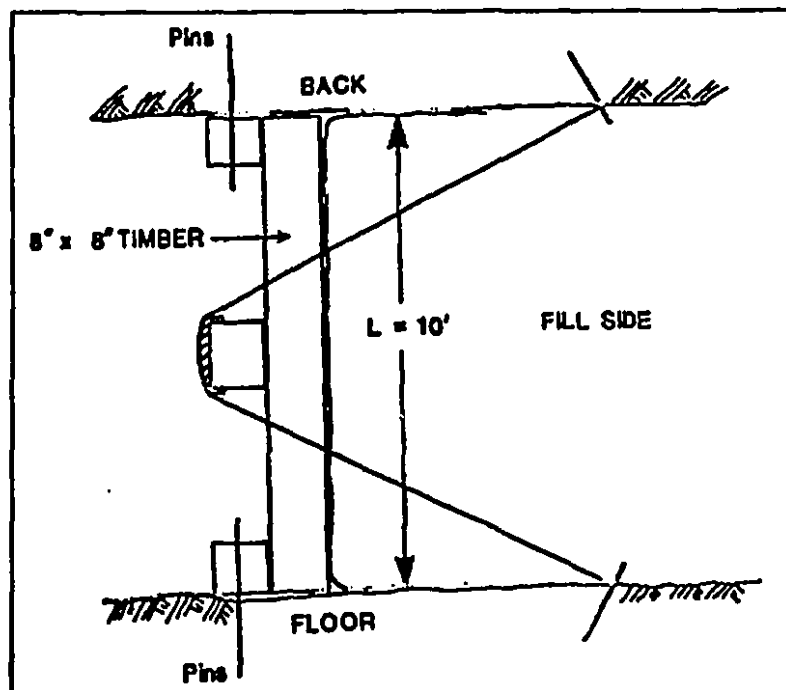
Use of steel cables as bracing for wooden bulkheads in the Horne mine.
